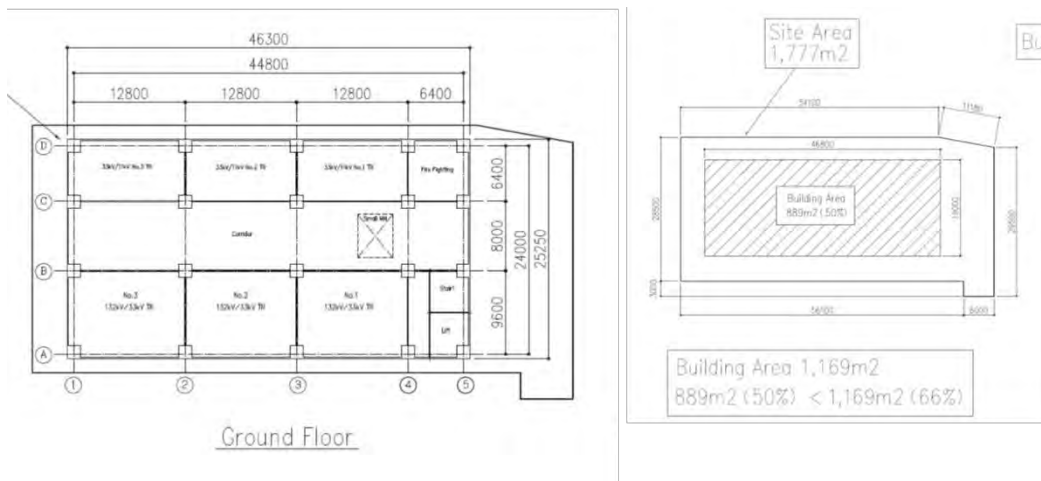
Layout Study for Indoor Substation in Lalmatia
